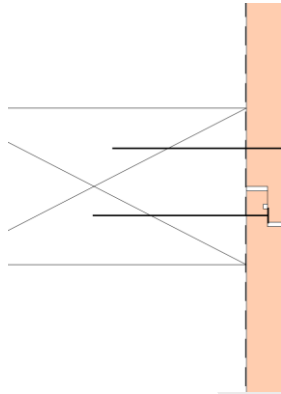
Sheet Cladding Hardboard and Plywood Horizontal Joint
